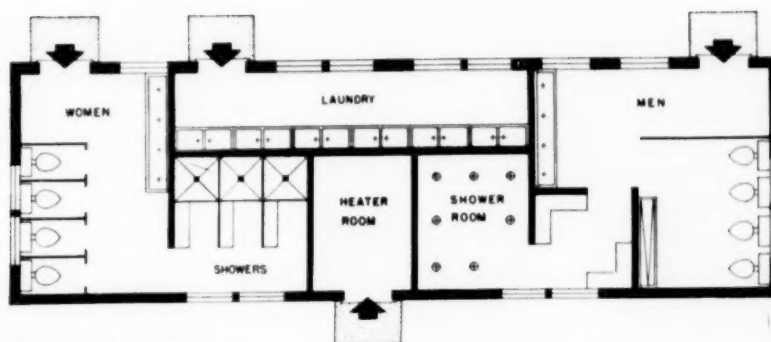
A 16-by-52-foot combination bath and wash house. Plan #2425
